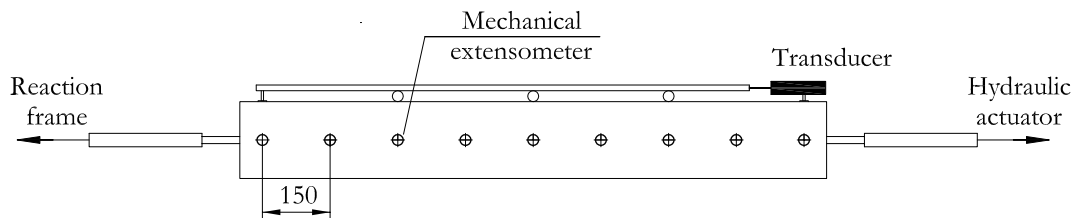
Sketch of GFRP RC tensile test setup (units in mm).
